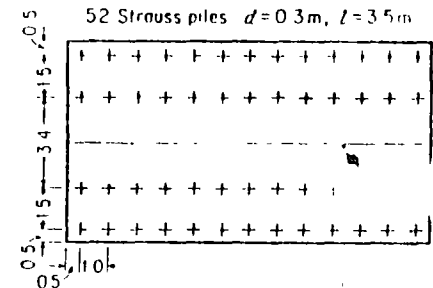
Distribution of situ-cast concrete bore piles under the foundation of Fig. VII-1
